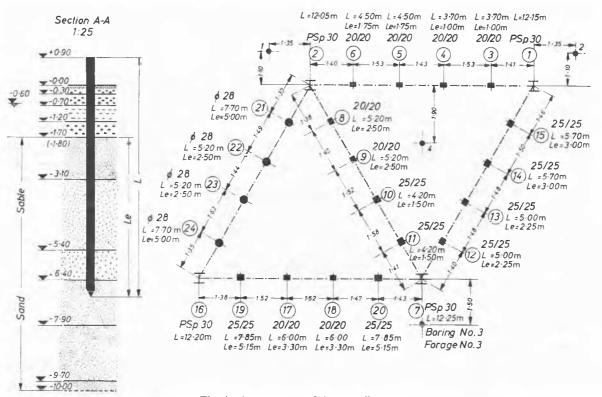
Arrangement of the test piles Arrangement des pieux d'essai
